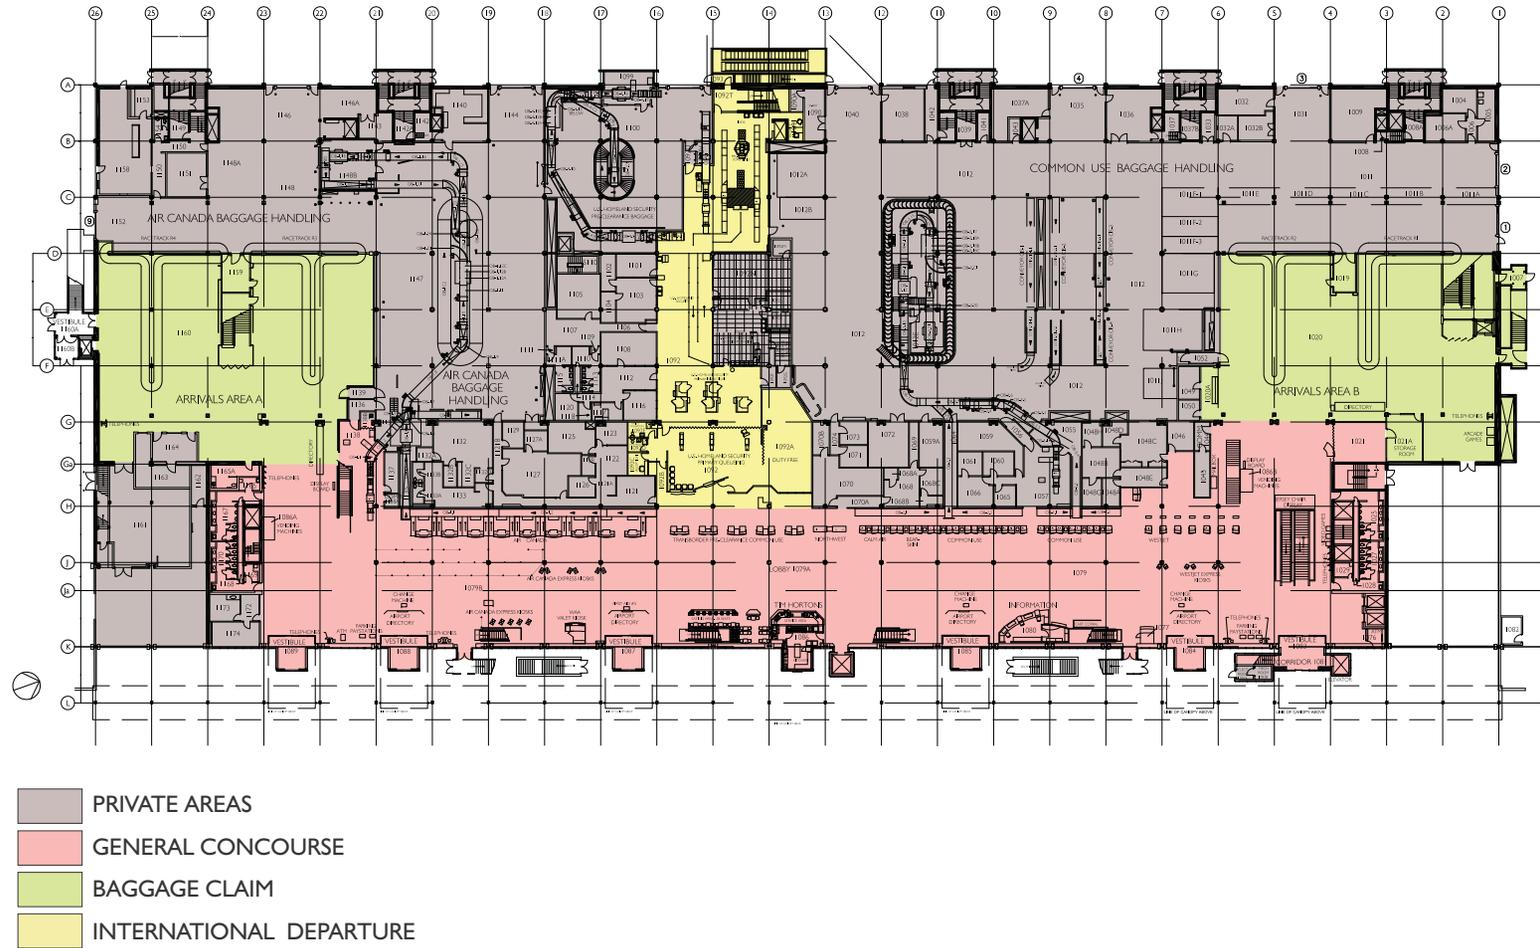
Main Level: Existing Winnipeg International Airport Floorplan
